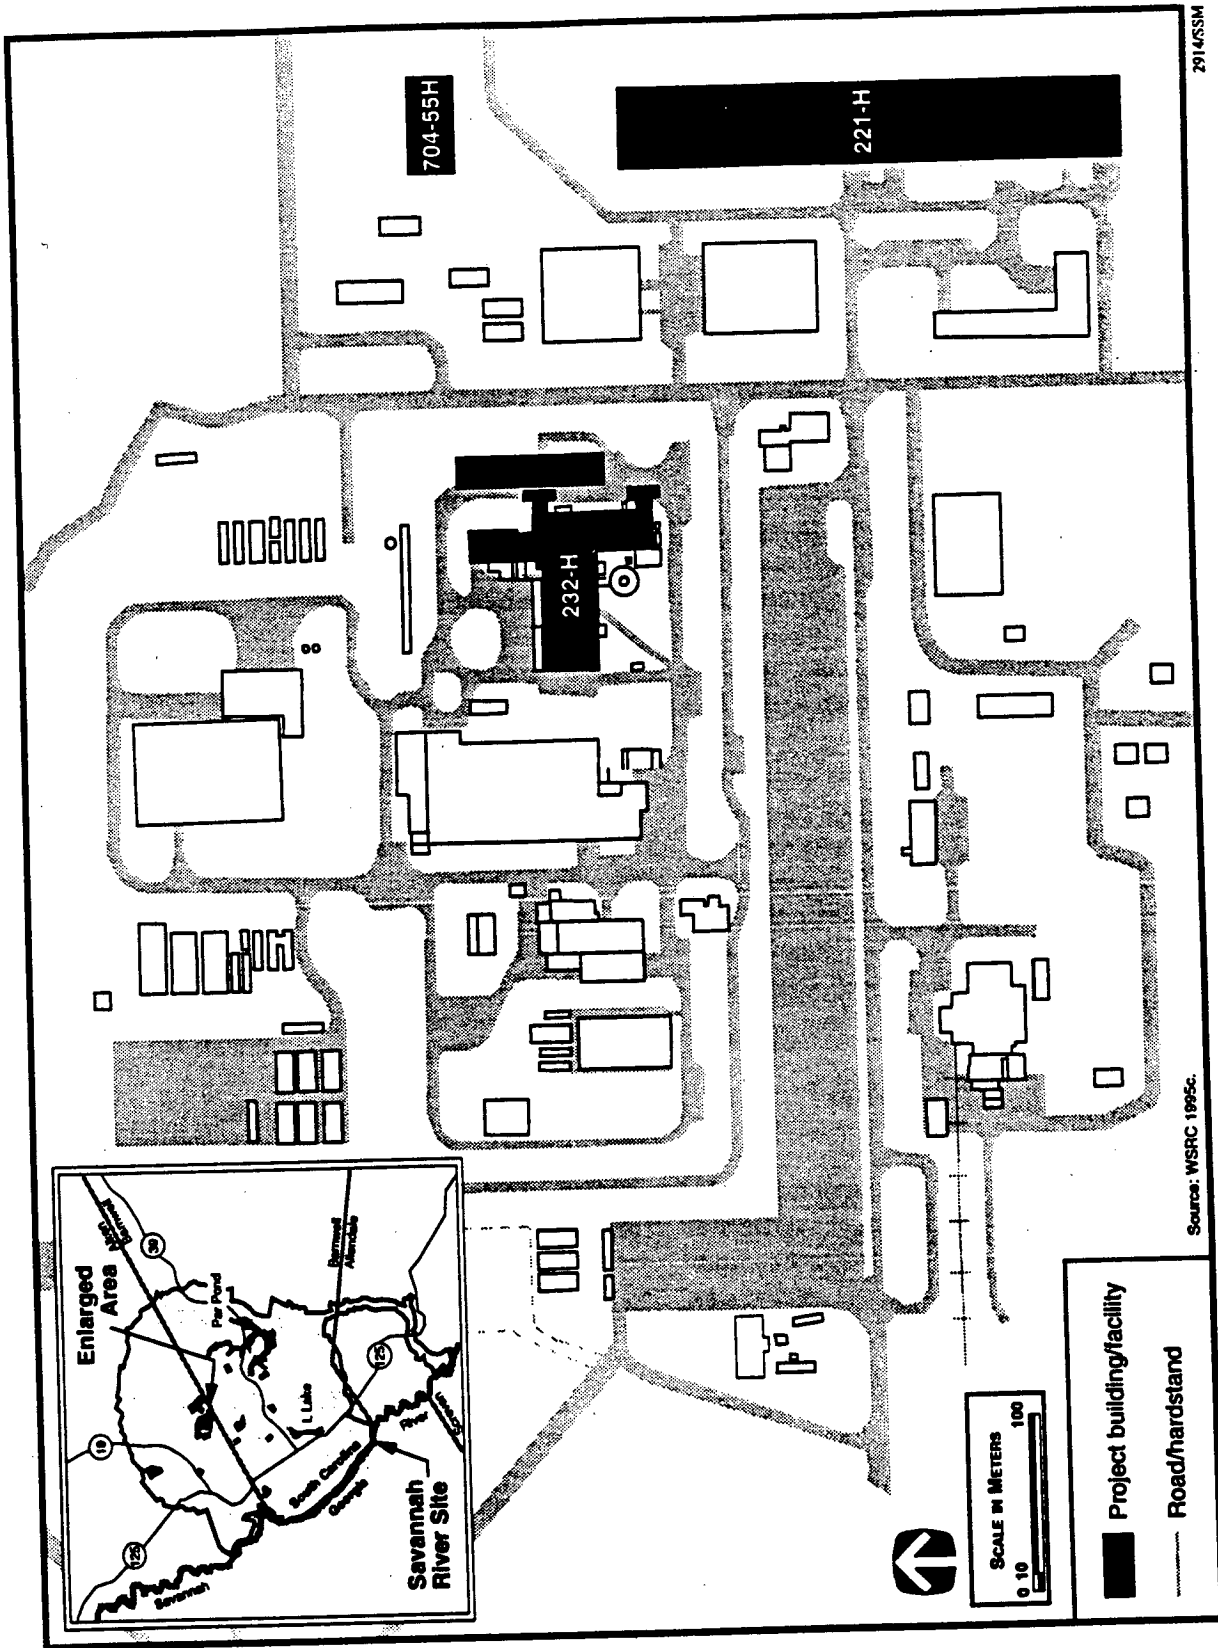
Pit Fabrication Facility Site Plan at Savannah River Site.
